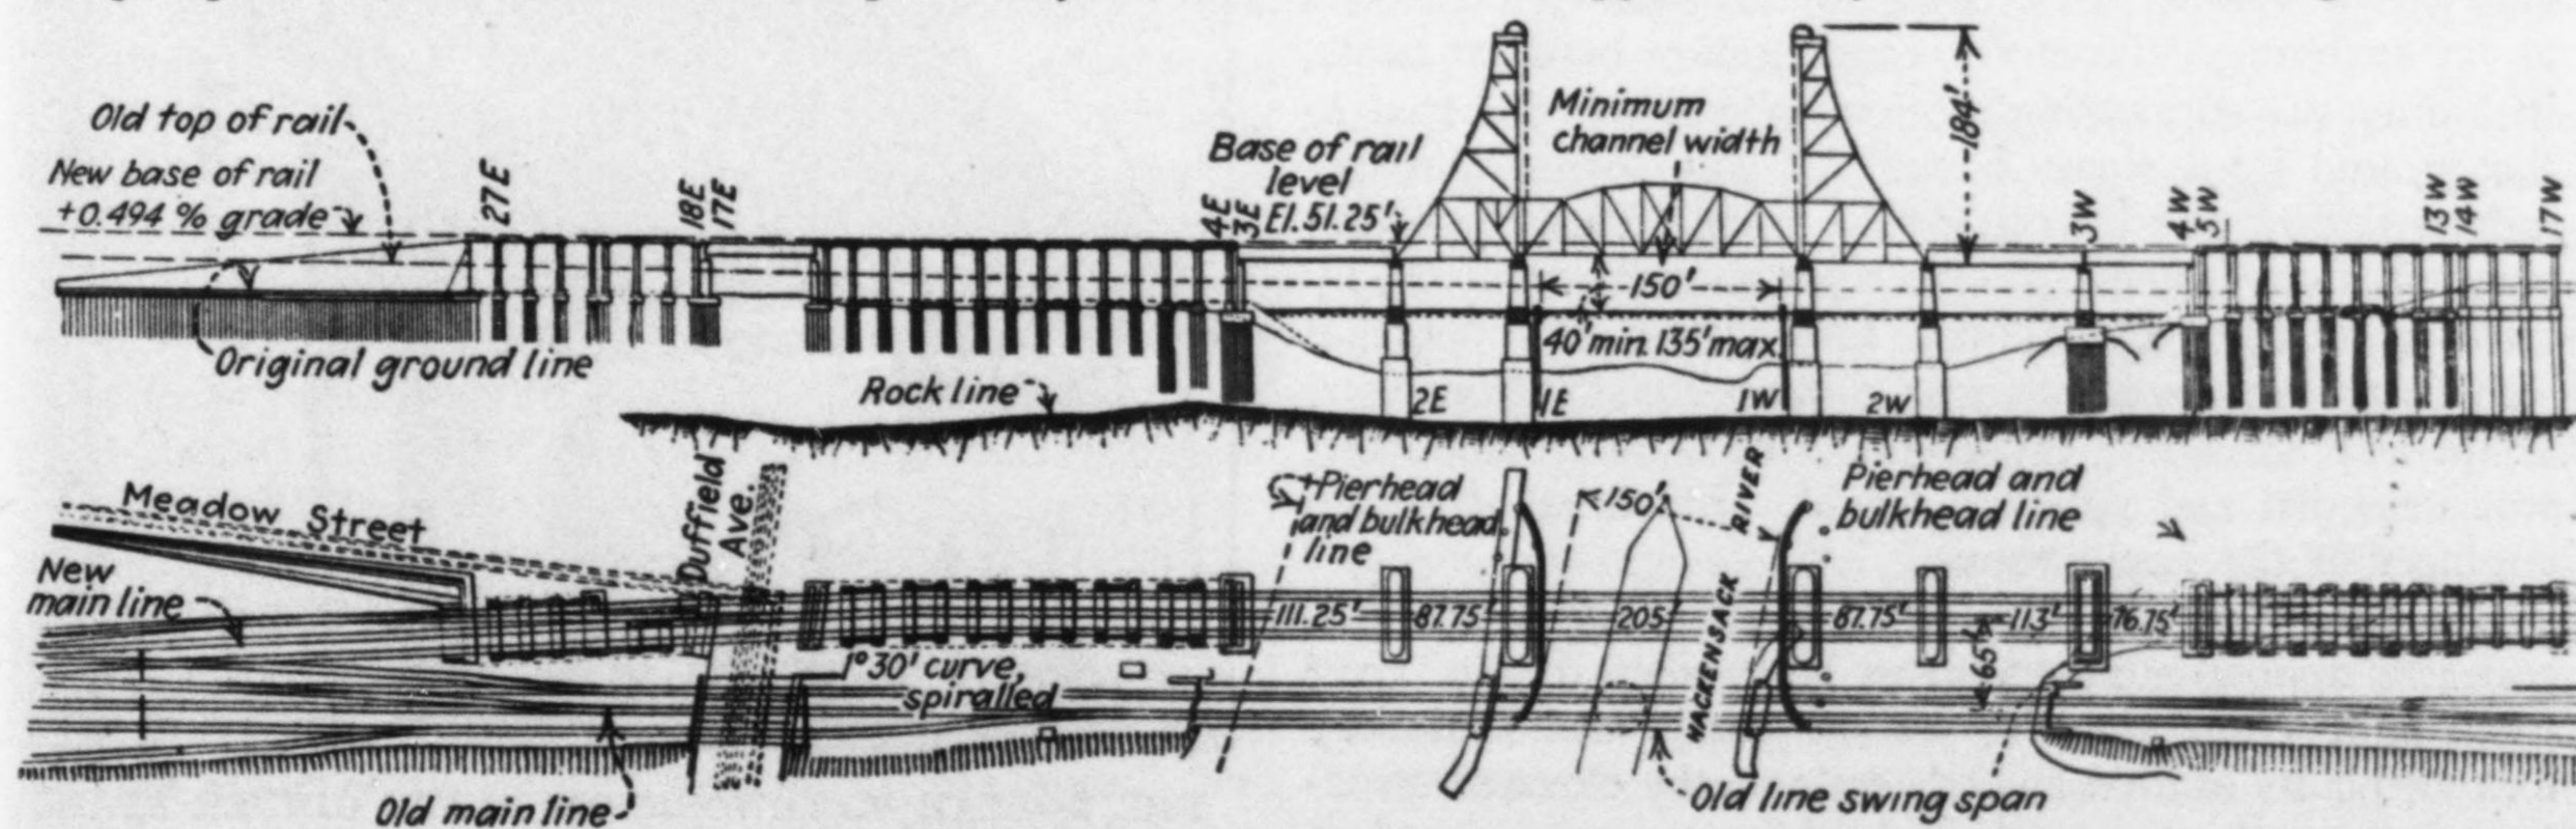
PLAN AND PROFILE HACKENSACK RIVER CROSSING, D.L.&W. R.R.
